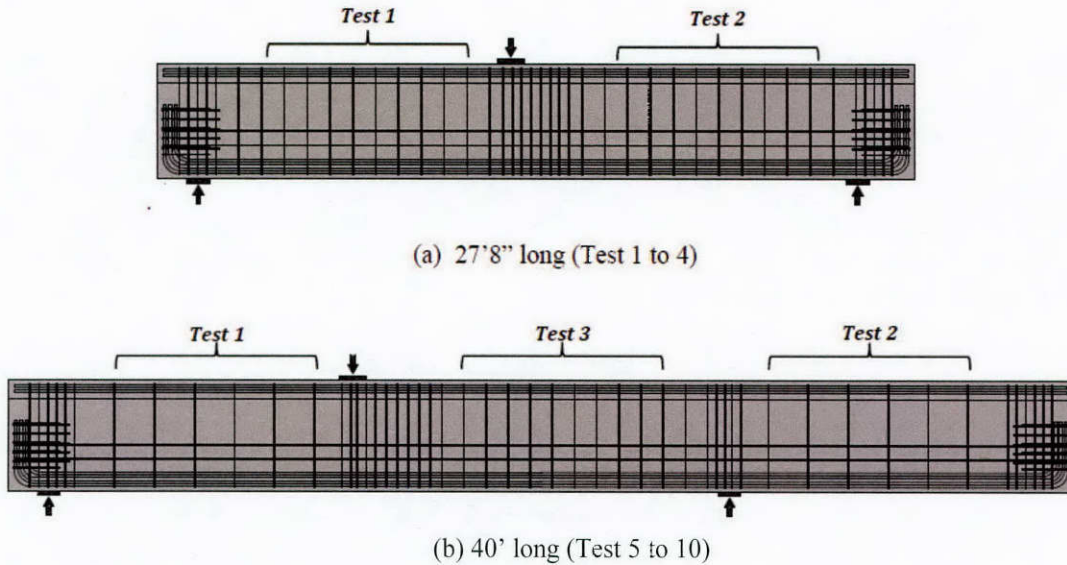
Steel cage of 48-in. T-beams, 27'8'' beam (top), 40' beam (bottom)
